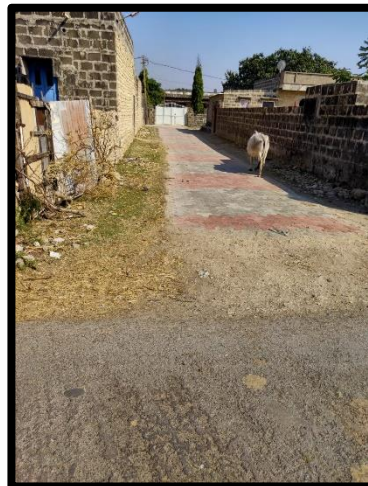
RCC House (Pucca House & Kuchha House)
